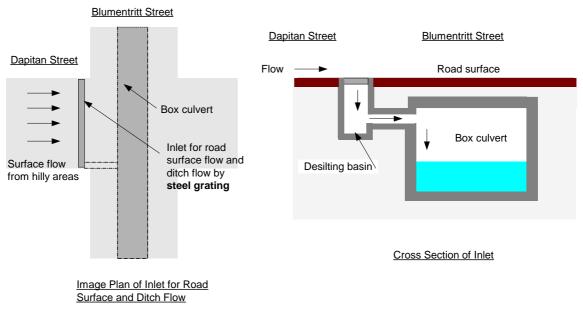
Inlet for Road Surface Flow into Box Culvert
